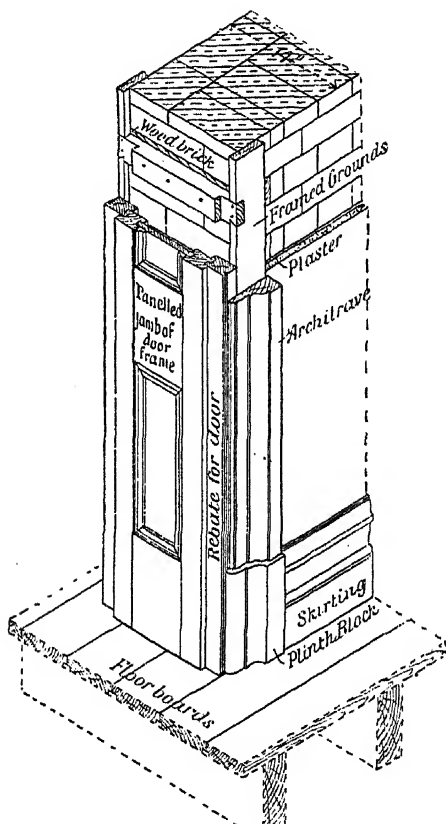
Sketch of lower part of Panelled Door Frame fixed in a 14" Inside Wall.
